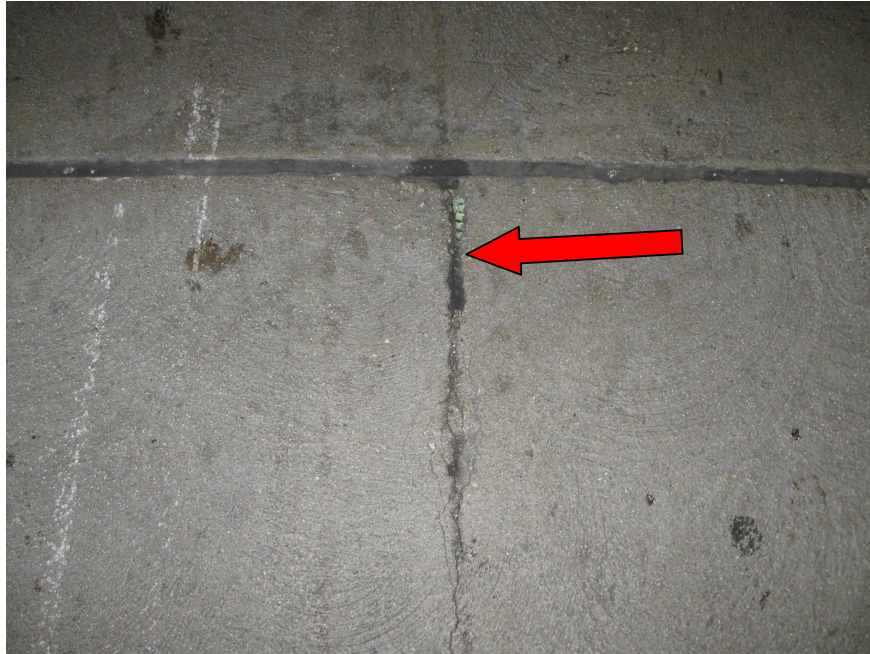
Arrow denotes slab spall/delamination; not exposed reinforcing steel
